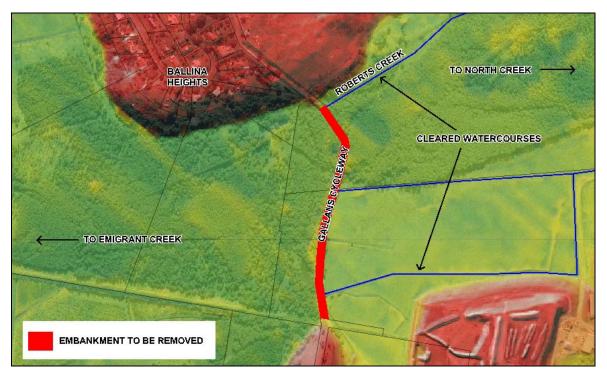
Plan of Gallans Road Cycleway Floodway Option 1
